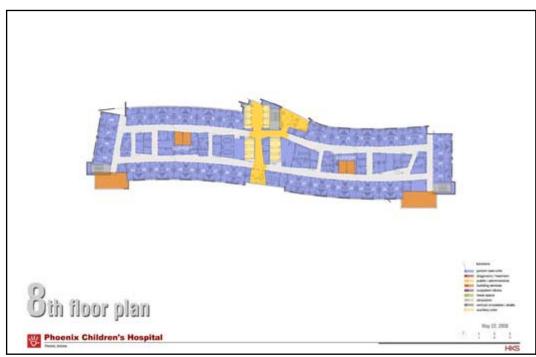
24 Eighth Floor Plan, Phoenix Children's Hospital
